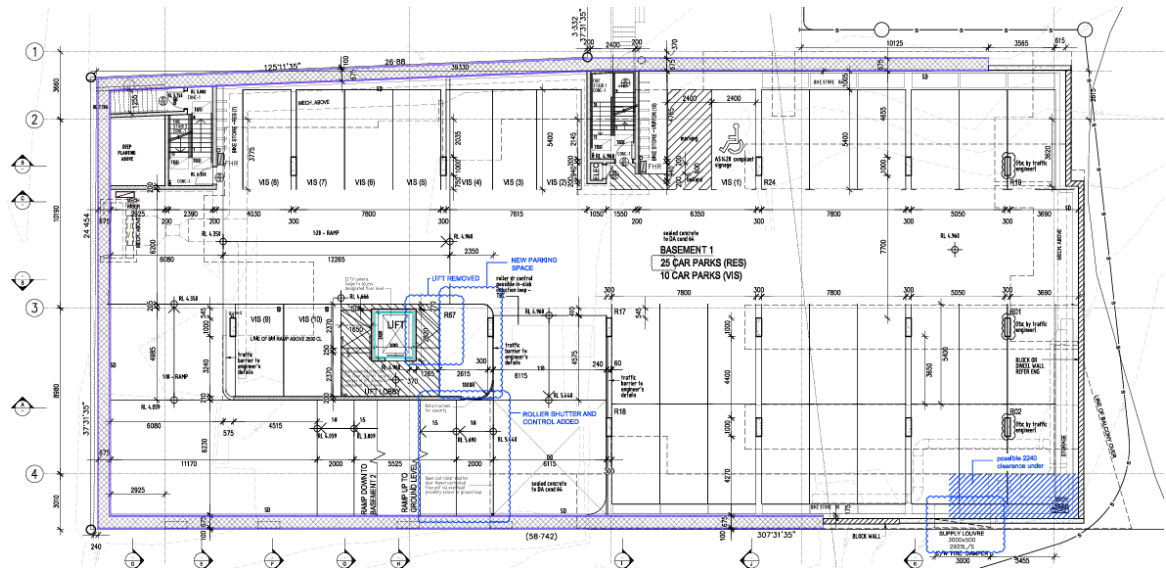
Extract from amended Basement 1 plan - parking supply and secure gate/control arrangement
